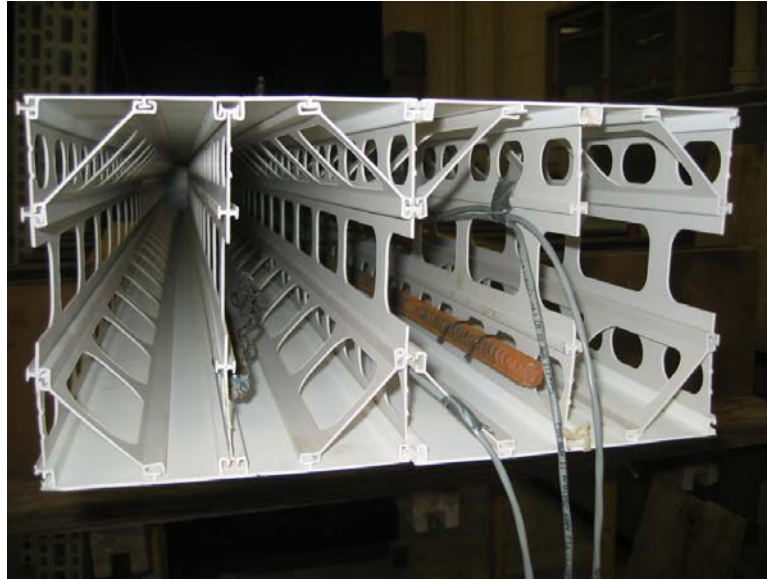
Cross section of a wall specimen with middle and inclined connectors reinforced with steel bars (Specimen D8RIM)
